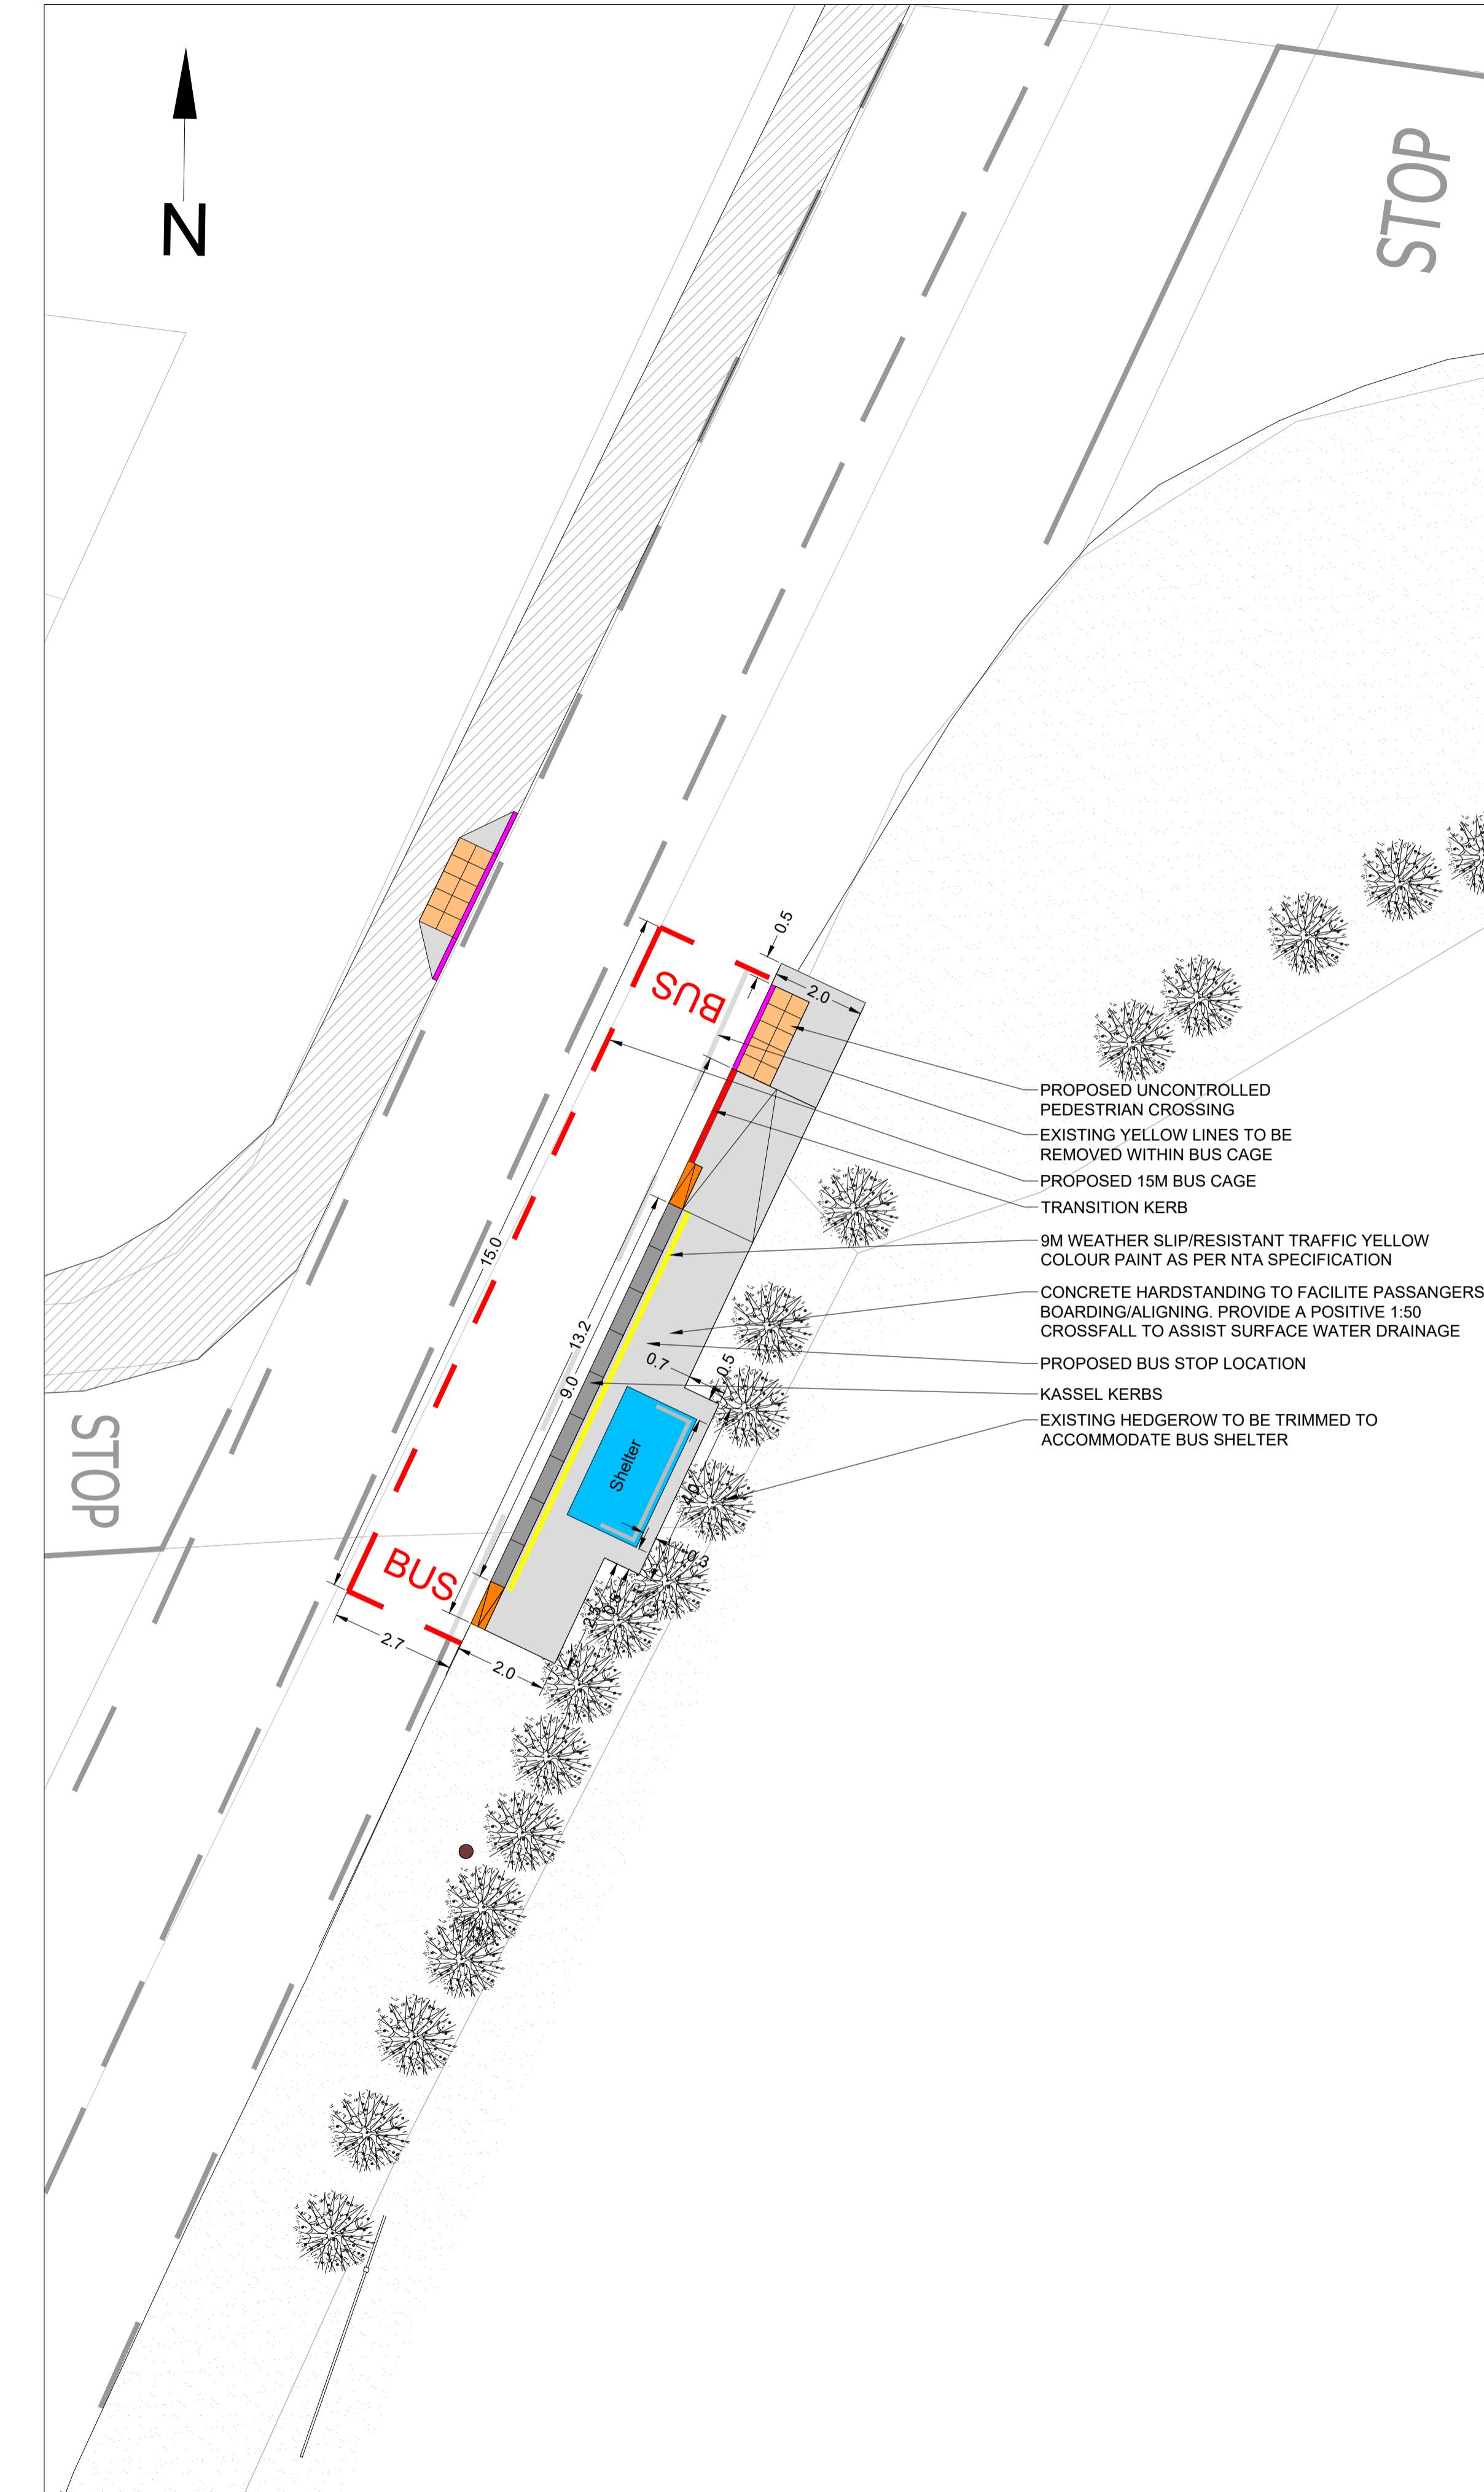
Southbound Bus Stop Detailed Layout Plan
